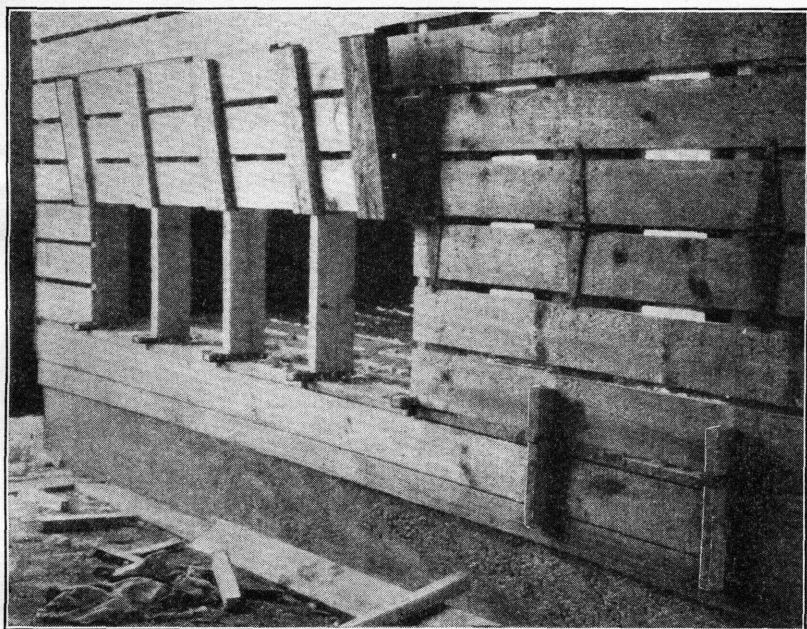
Shelling doors held closed by wedge blocks in strap irons fastened to studs
